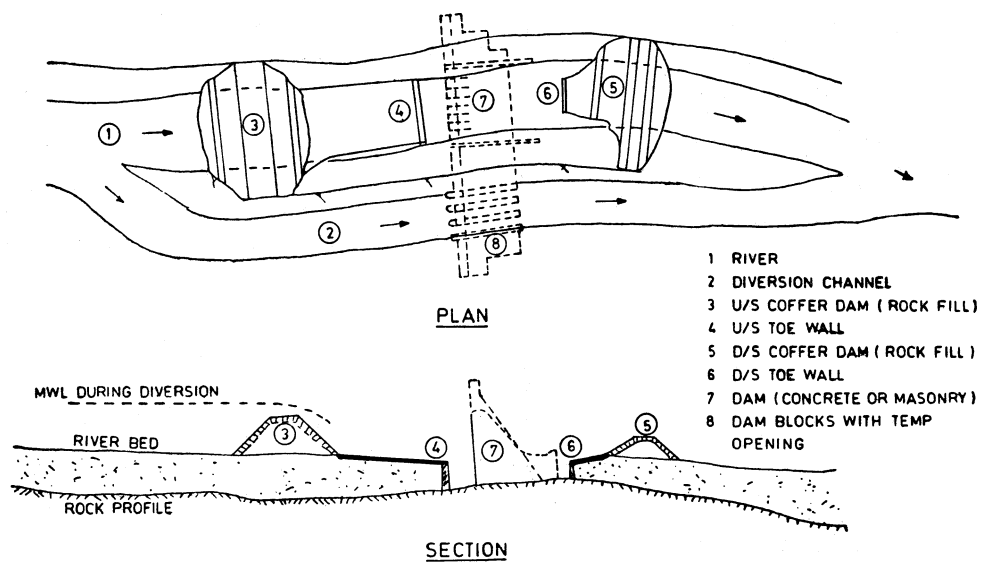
DIVERSION CHANNEL FOR CONCRETE/MASONRY DAM IN A NARROW RIVER
